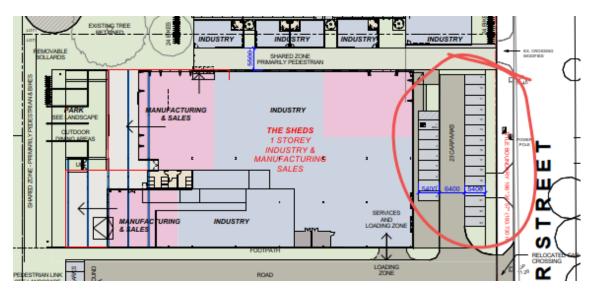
Proposed Ultimate Parking Arrangement, Source: Site Plan – proposed masterplan (TP004 Rev A) by Six Degrees Pty Ltd
